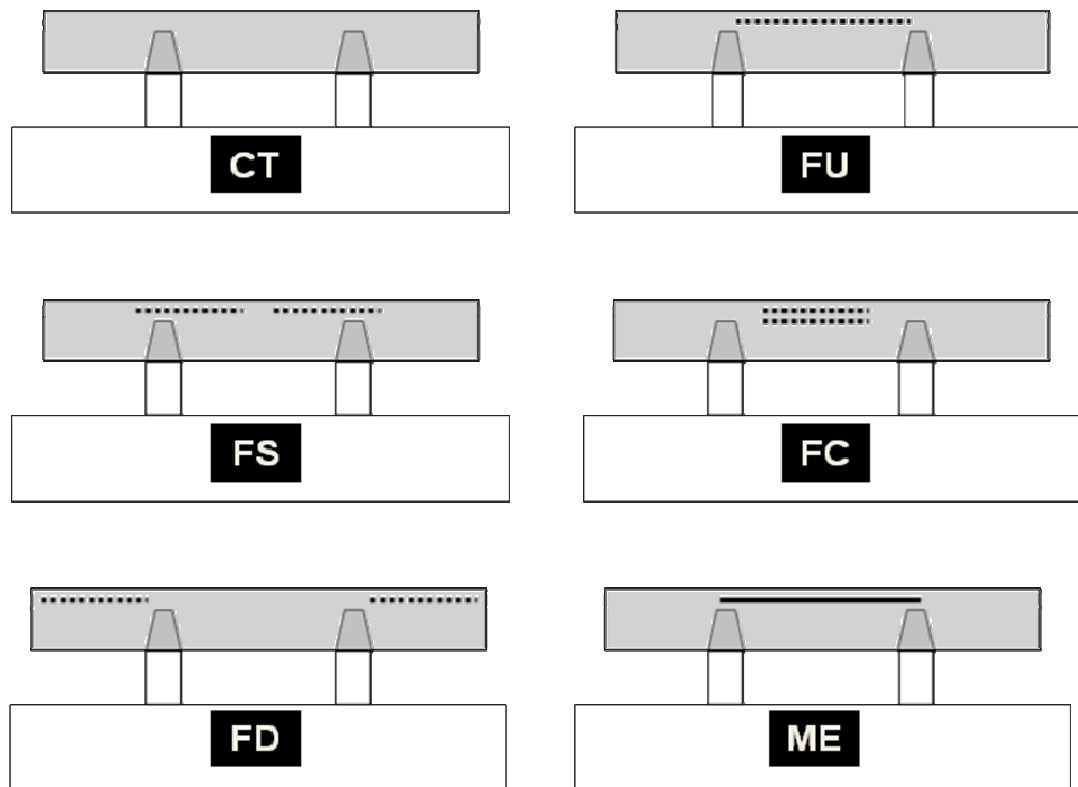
Illustration of specimens in each group based on reinforcement type and position.
